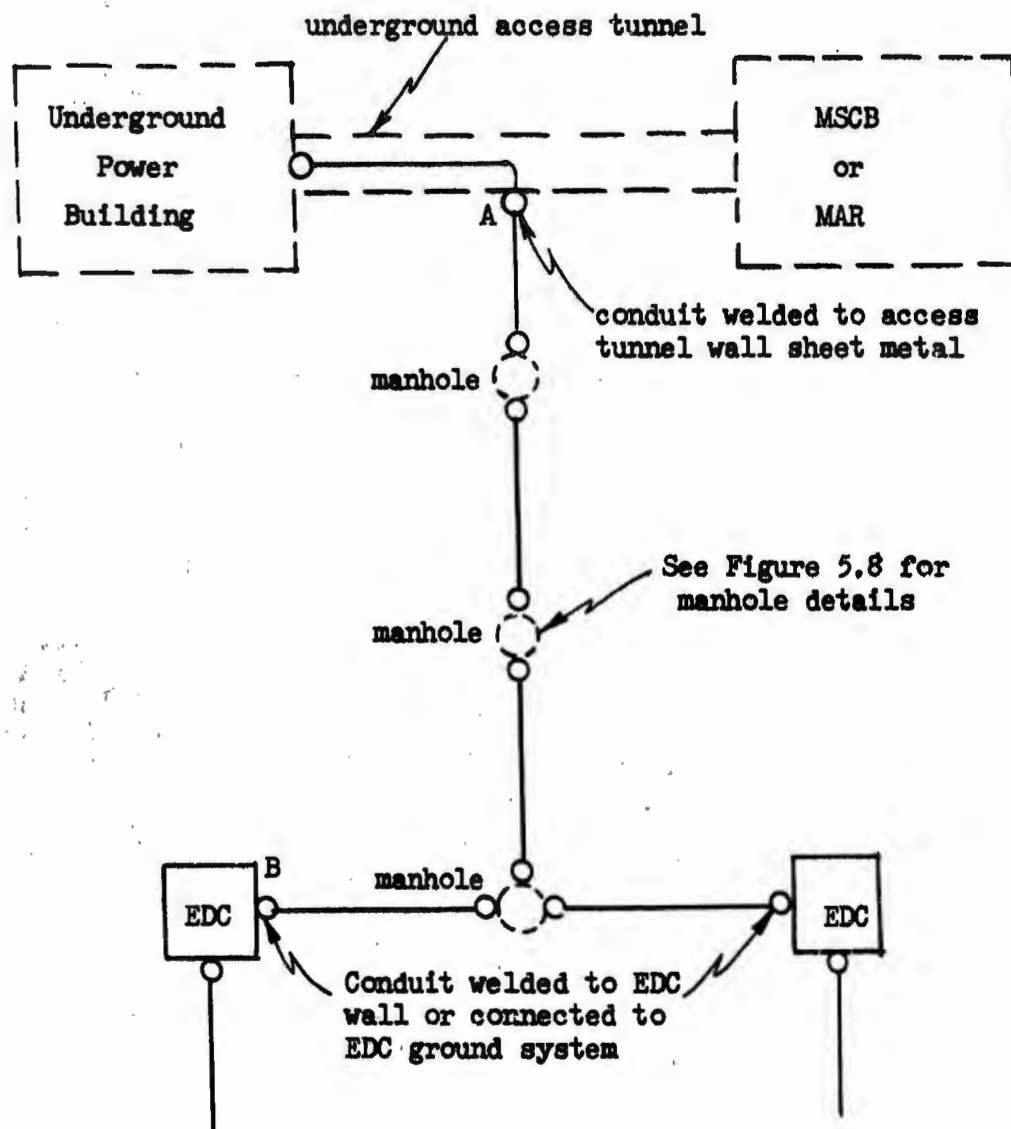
Defining Interconnecting Conduit Runs, A to B
